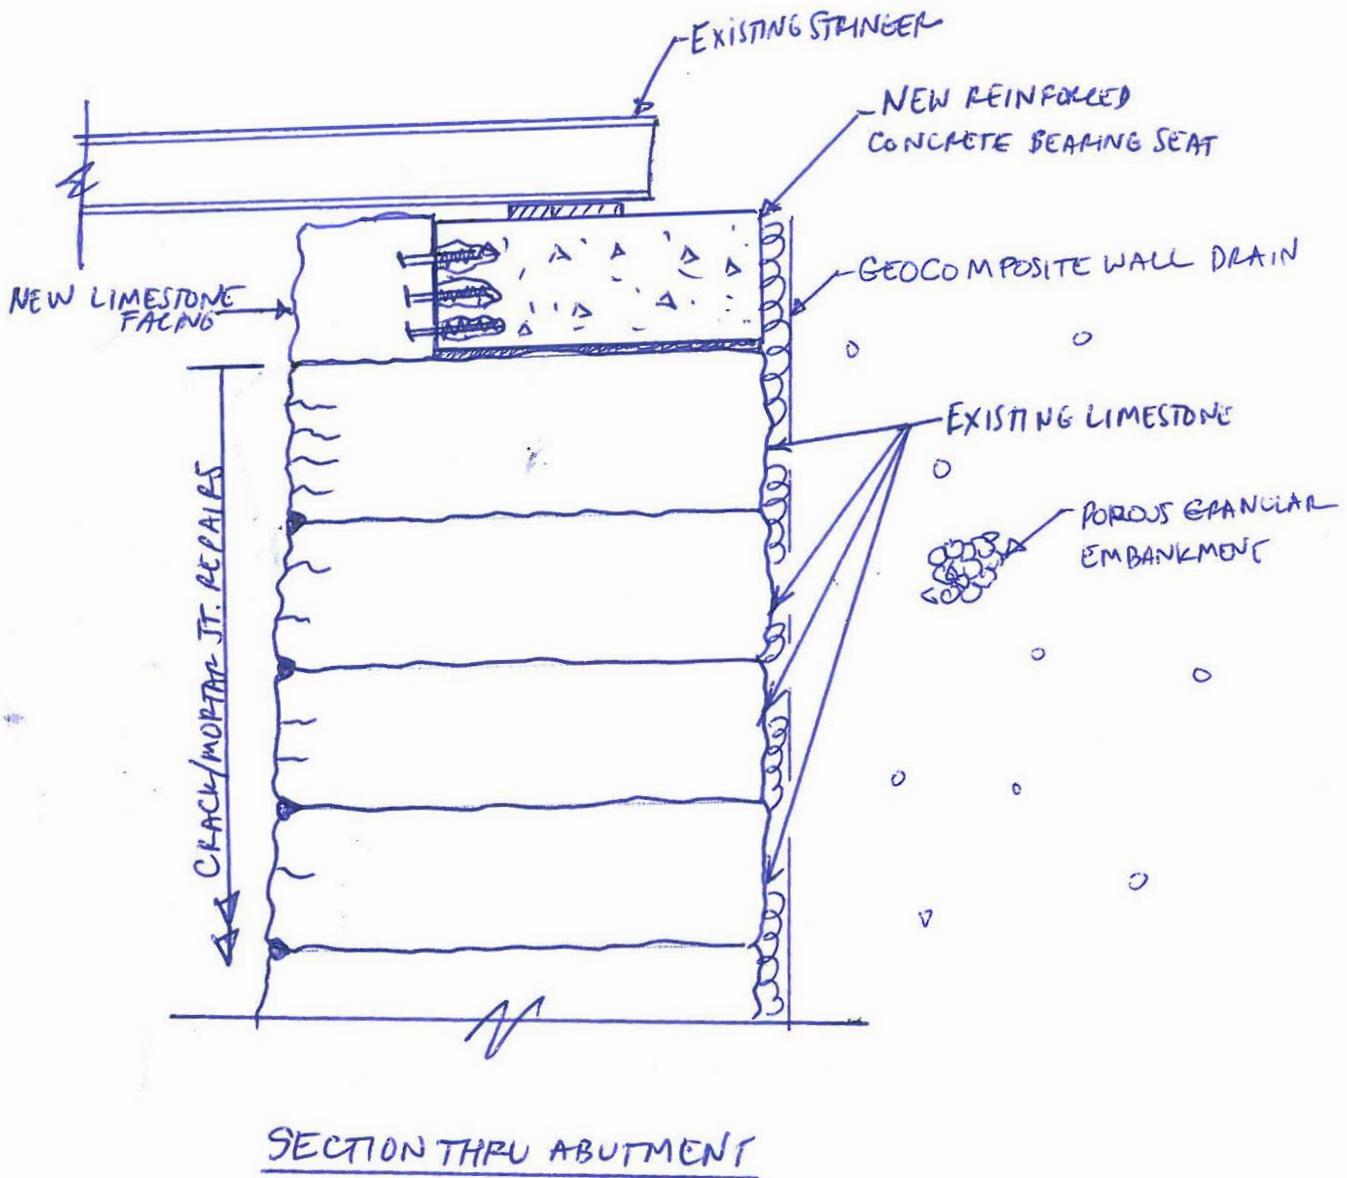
Proposed sketch detail for Coffin Rd. Bridge abutment repairs, top of wall. (H.W. Lochner, Inc.)
